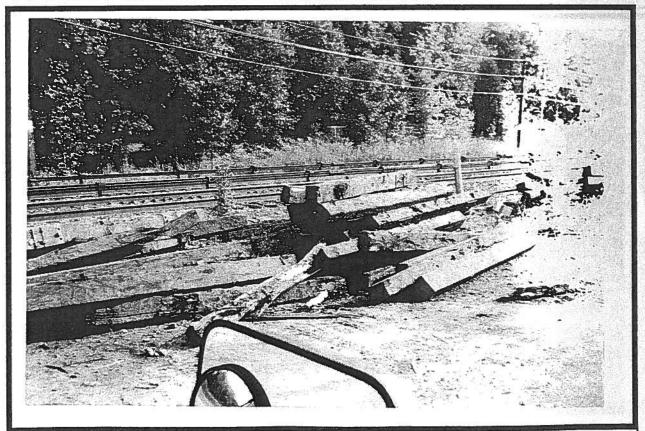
Railroad Tracks B ordering East Side of Property, Possibly Contaminated (Photo 3 of 3)
